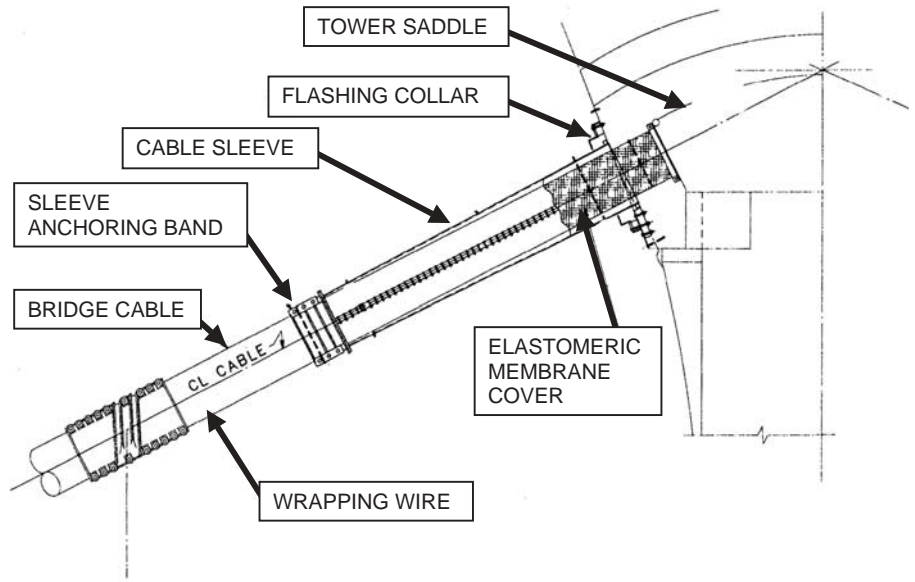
Protective sleeve adjacent to tower saddle.
